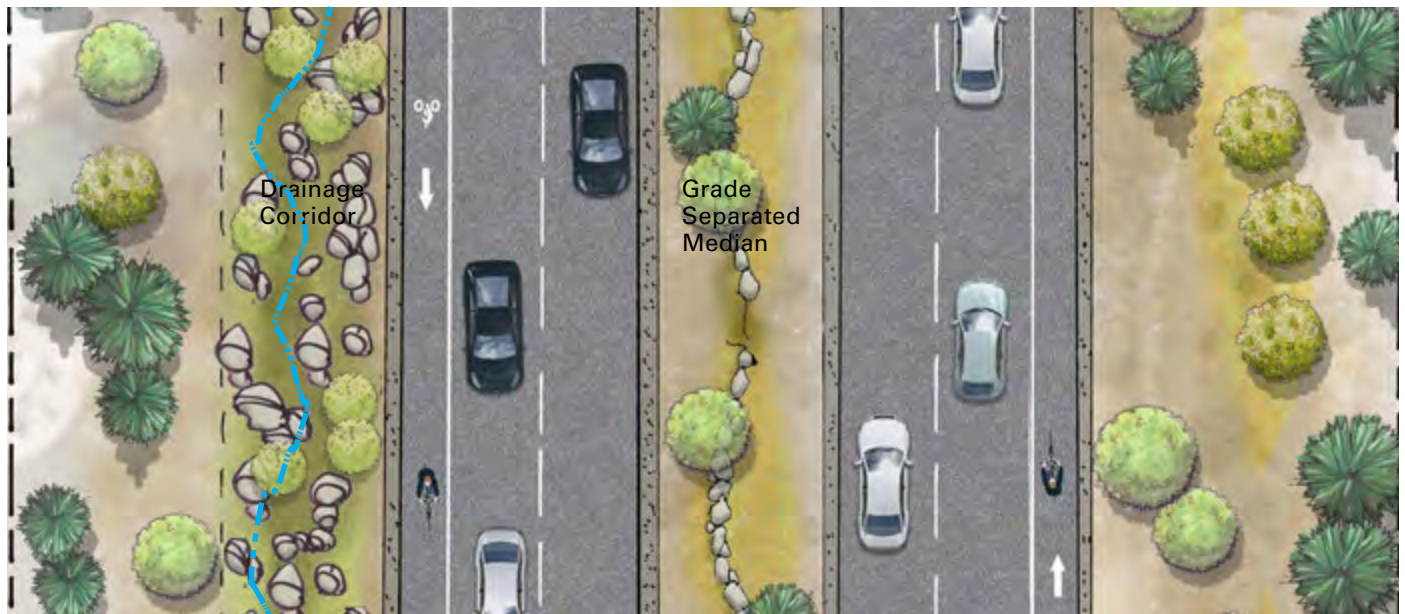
Typical Four Lane Arterial Parkway Section and Plan
